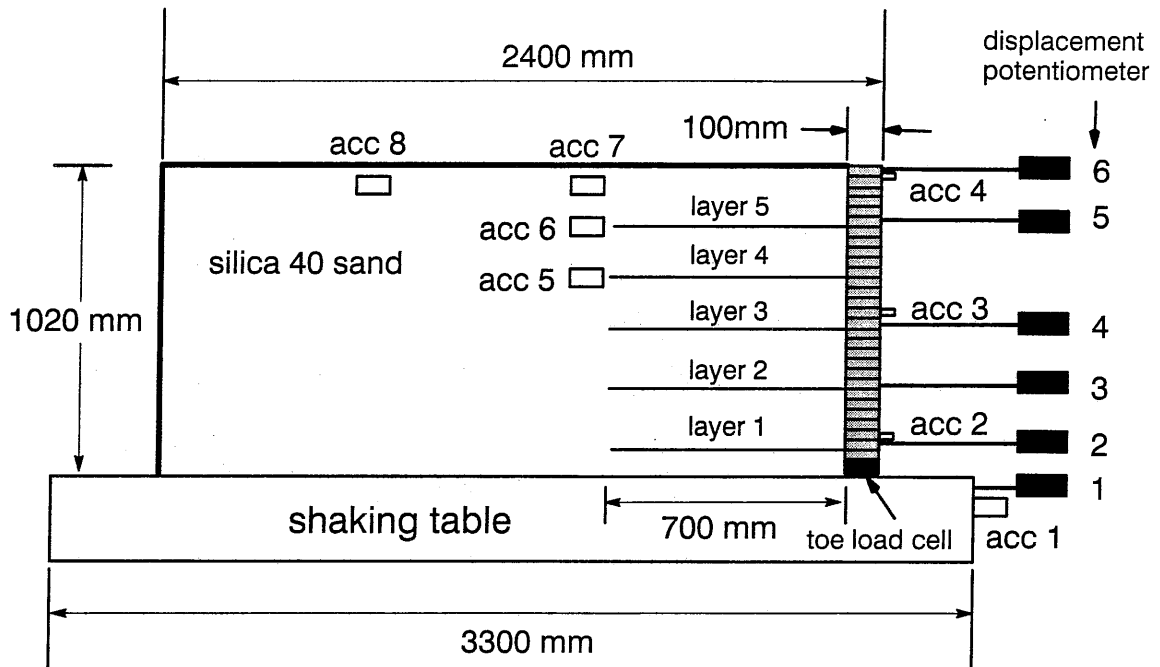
Example shaking table test model of reinforced segmental retaining wall.
